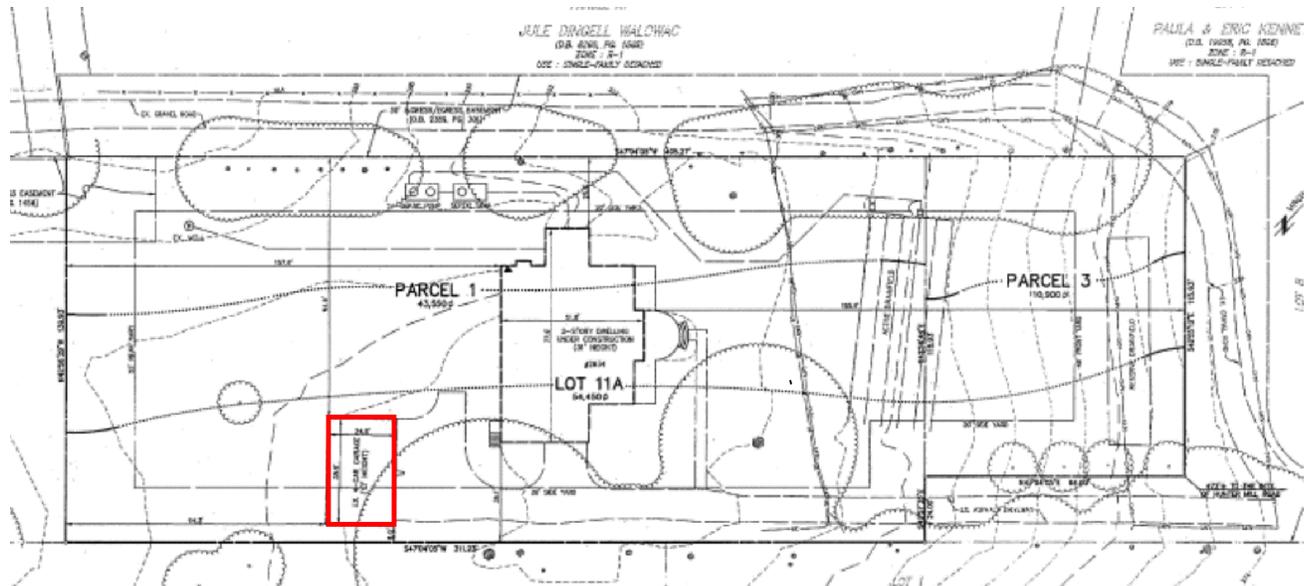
Special Permit Plat (partial), showing the existing garage in red. Source: Applicant.
